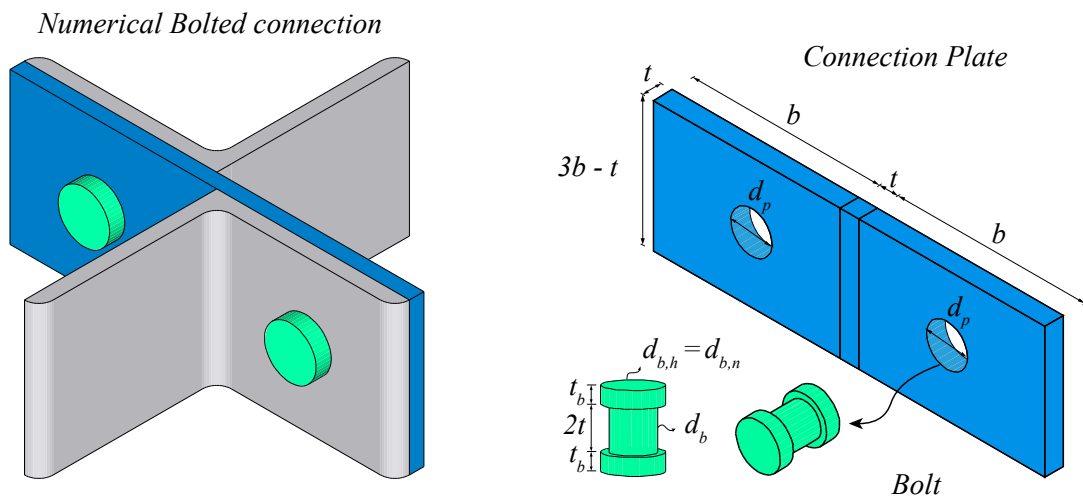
Finite element model bolt connection overview, including connection plate dimensions and bolt geometry.
